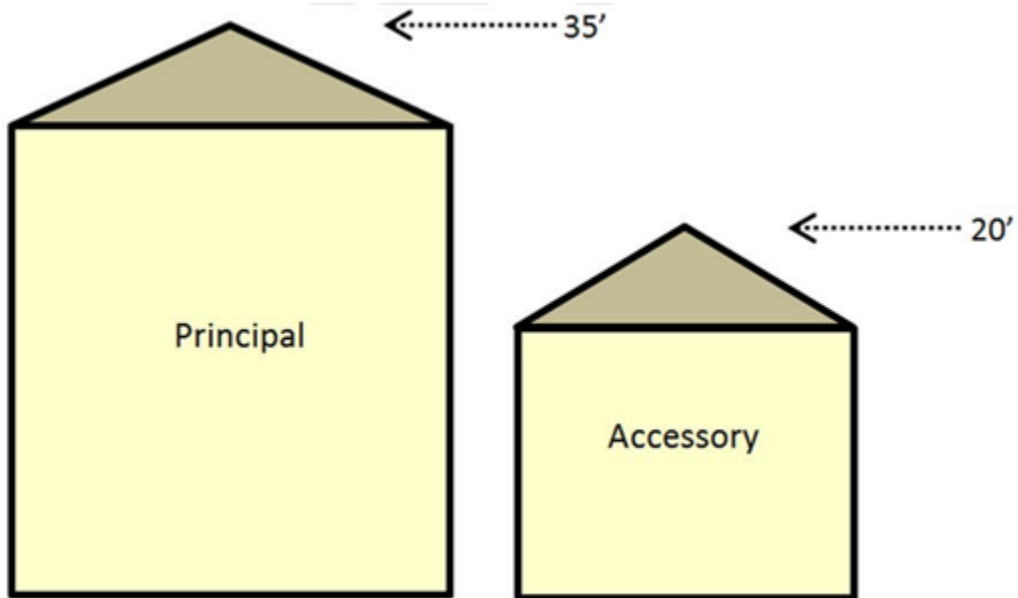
Typical MFR Zoning District Building Height Example (Abutting Lots Not Developed) (Not Drawn to Scale)
